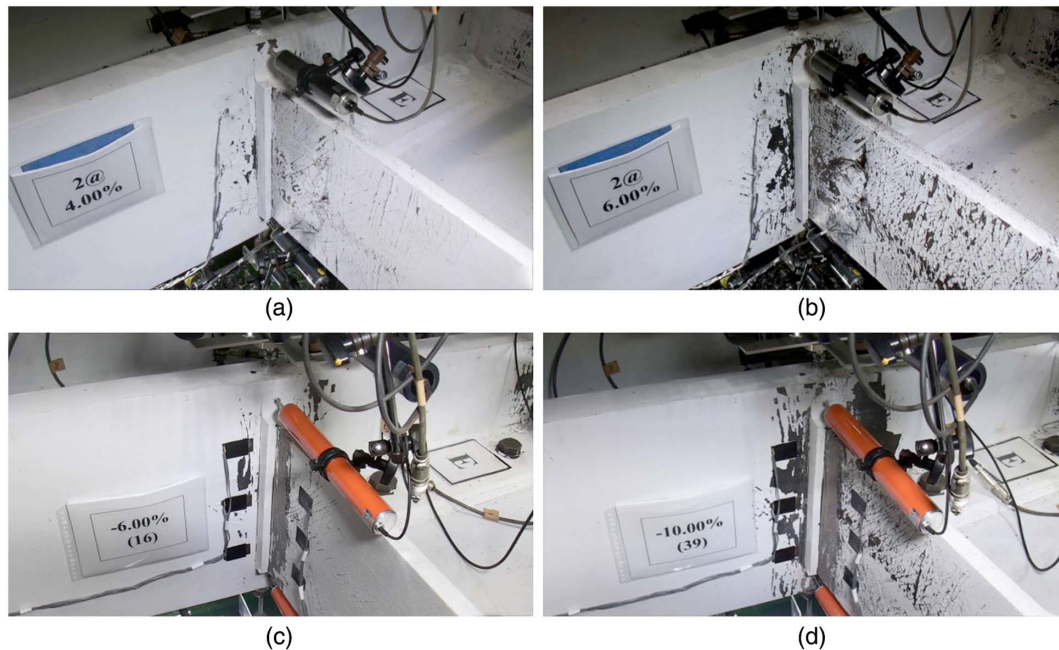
Bottom beam flanges at characteristic loading excursions: (a) Specimen 1 at 4% rad; (b) Specimen 1 at 6% rad; (c) Specimen 2 at 6% rad (near fault loading protocol); and (d) Specimen 2 at 10% rad (collapse consistent loading protocol).
